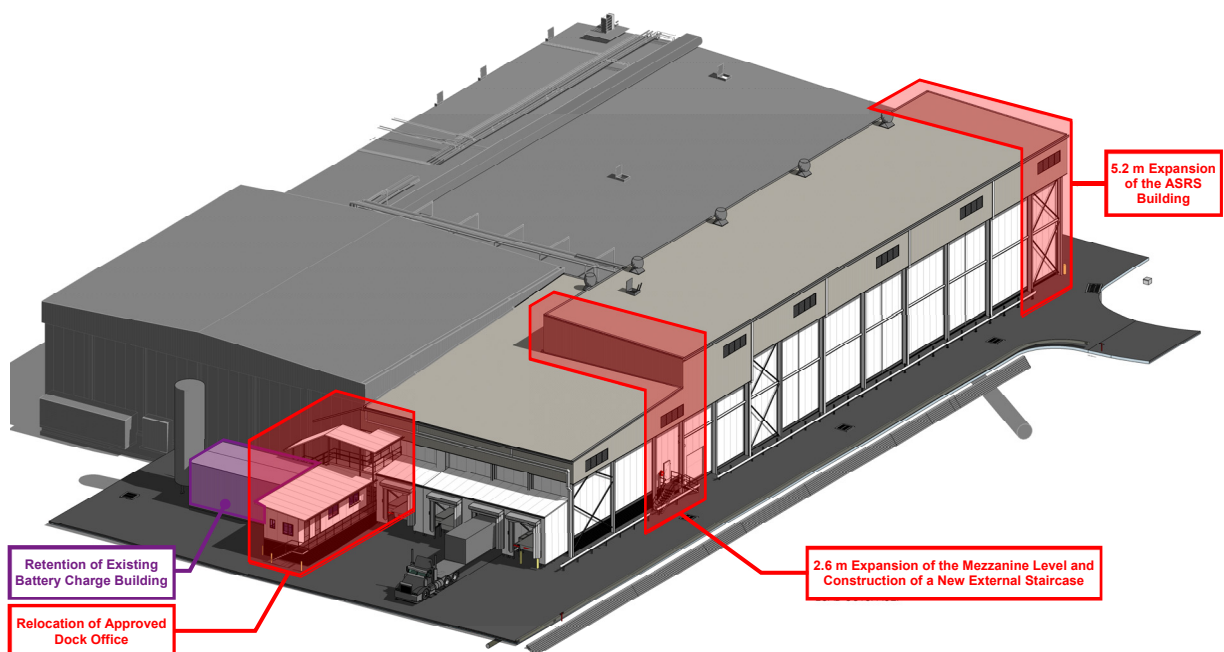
| Overview of external alterations and additions to the approved ASRS building
